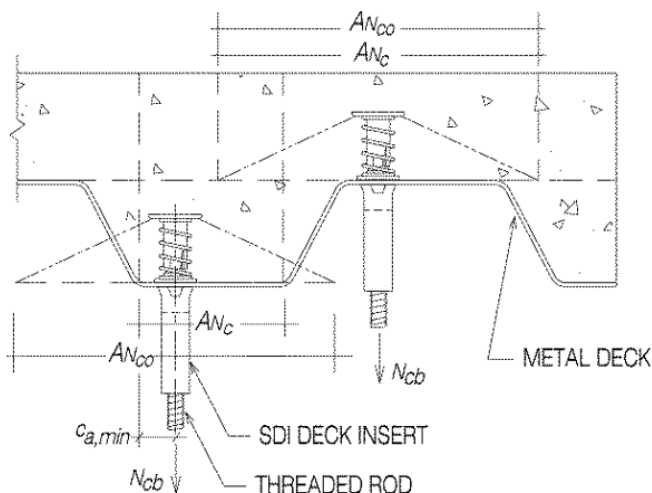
IDEALIZATION OF CONCRETE ON DECK FOR DETERMINATION OF CONCRETE BREAKOUT STRENGTH IN ACCORDANCE WITH ACI 318
